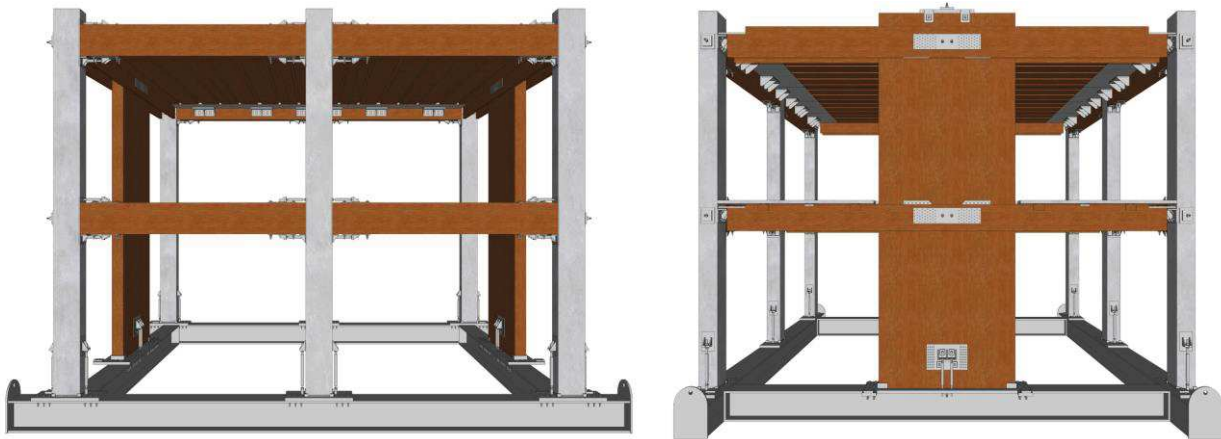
Elevation views of both the frame (left) and wall (right) directions of the Skeleton Building.
